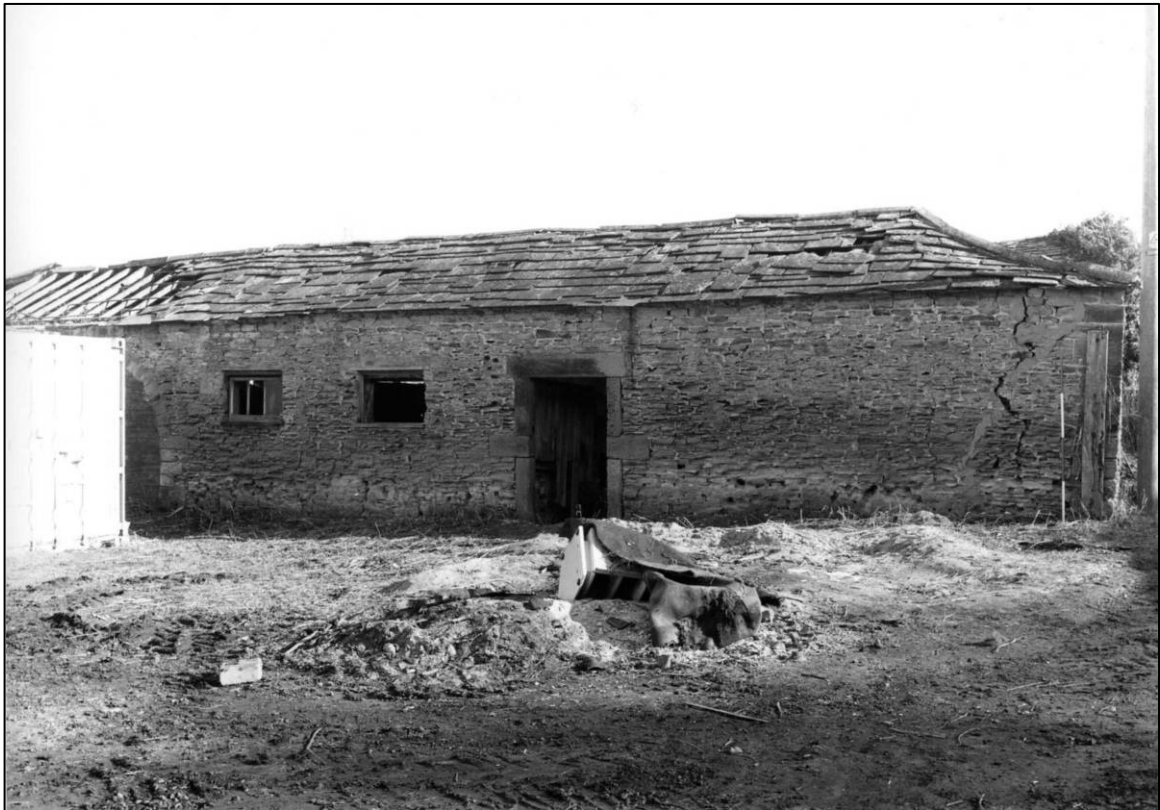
West coach house and stable range, W elevation, S part, looking E (photo 1/4).
